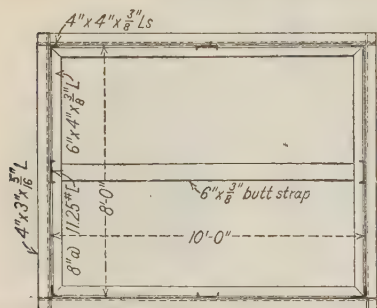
50-ton flat-bottom rectangular steel bin.
